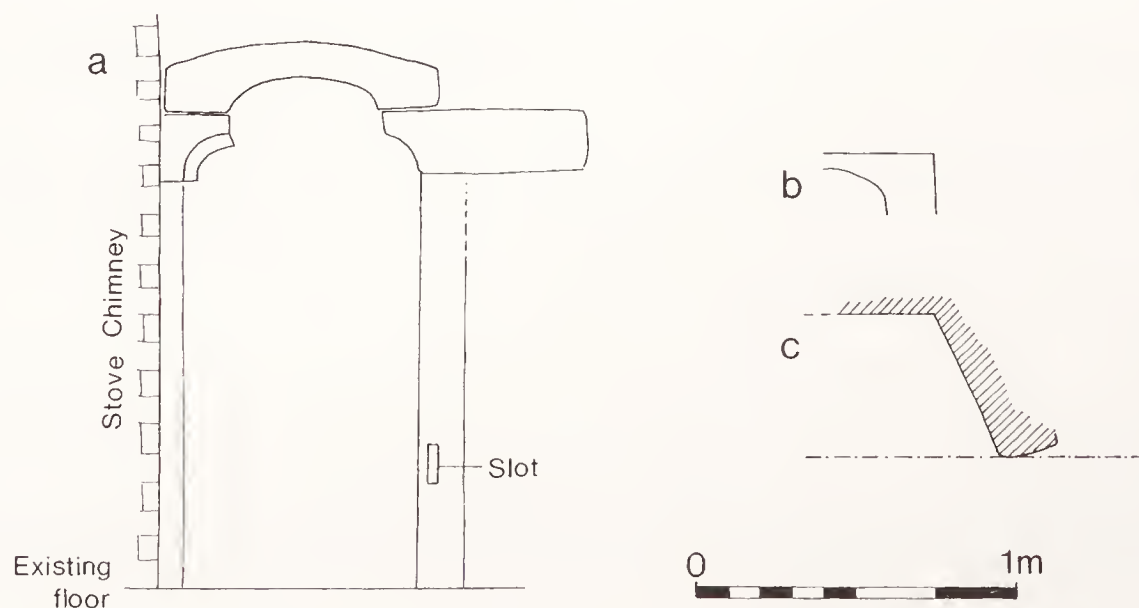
Chancel north wall: a, detail of blocked door at west end of interior; b, detail of doorhead visible in external wall, c, plan of door opening from exterior (all detail now hidden beneath facing stone and plaster).
